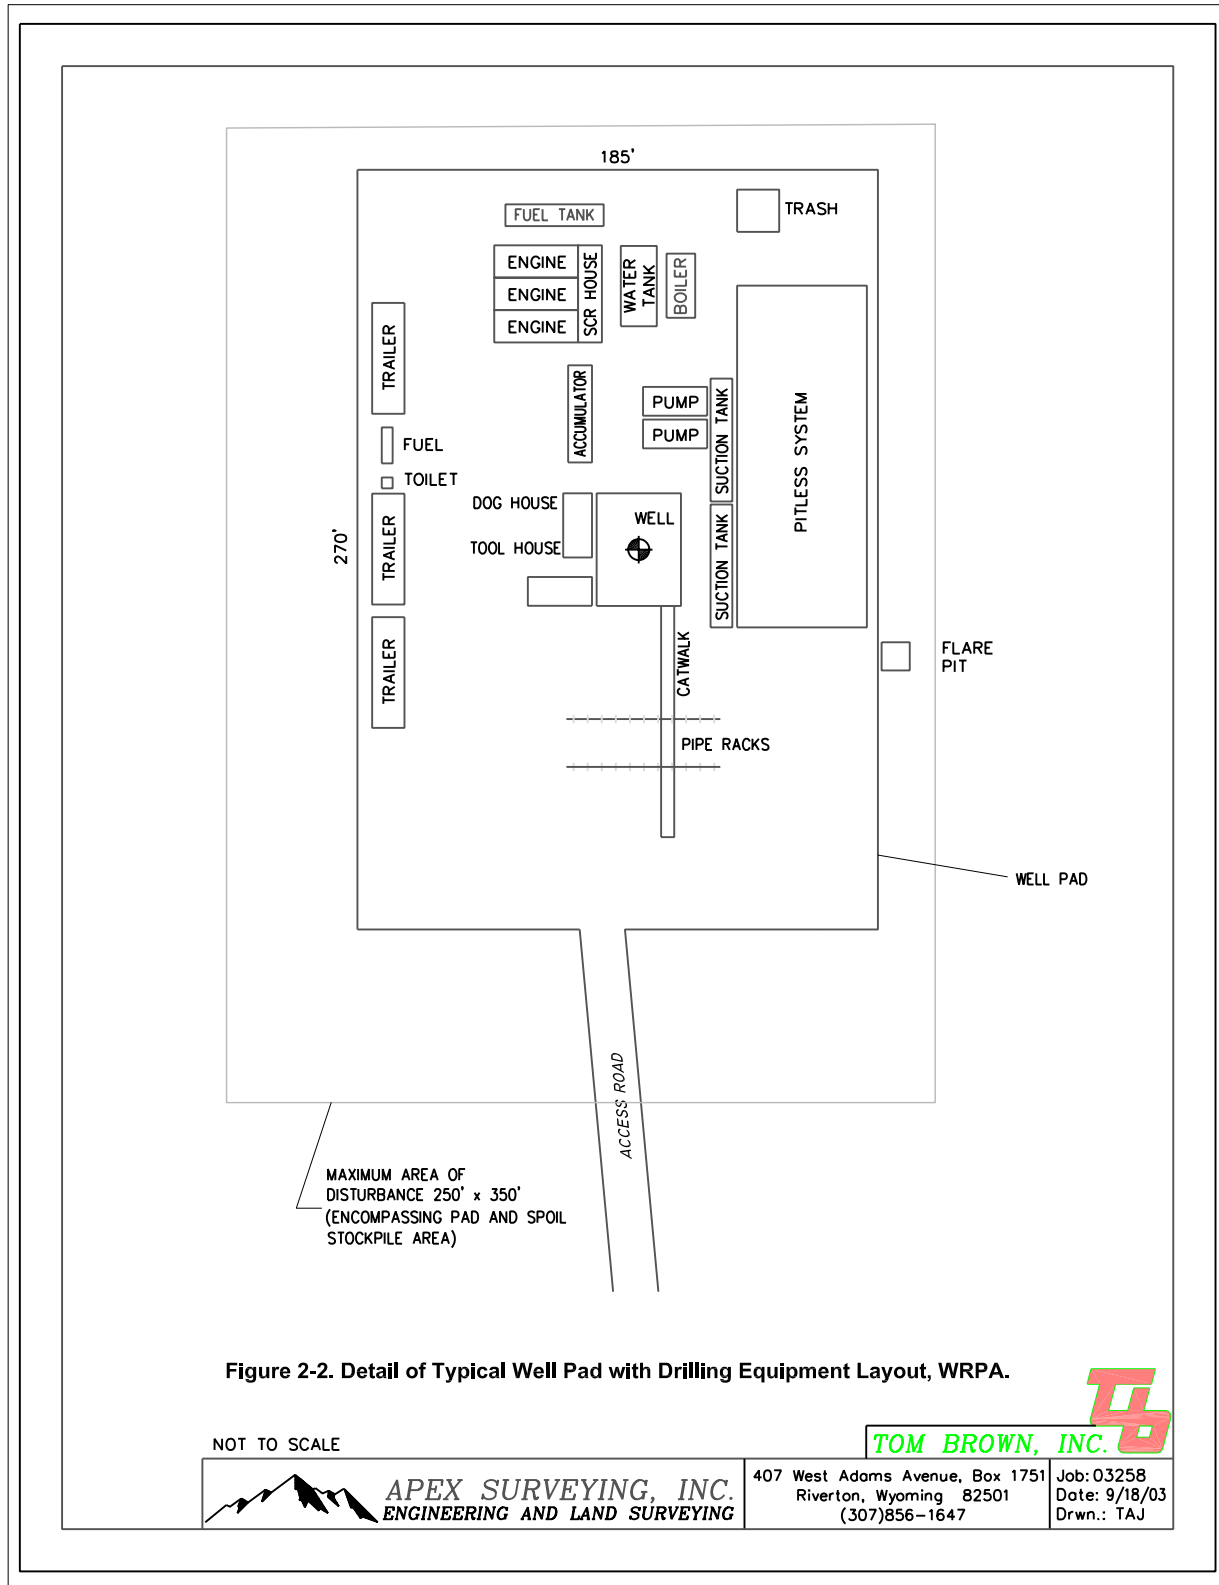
Detail of Typical Well Pad with Drilling Equipment Layout, WRPA.
